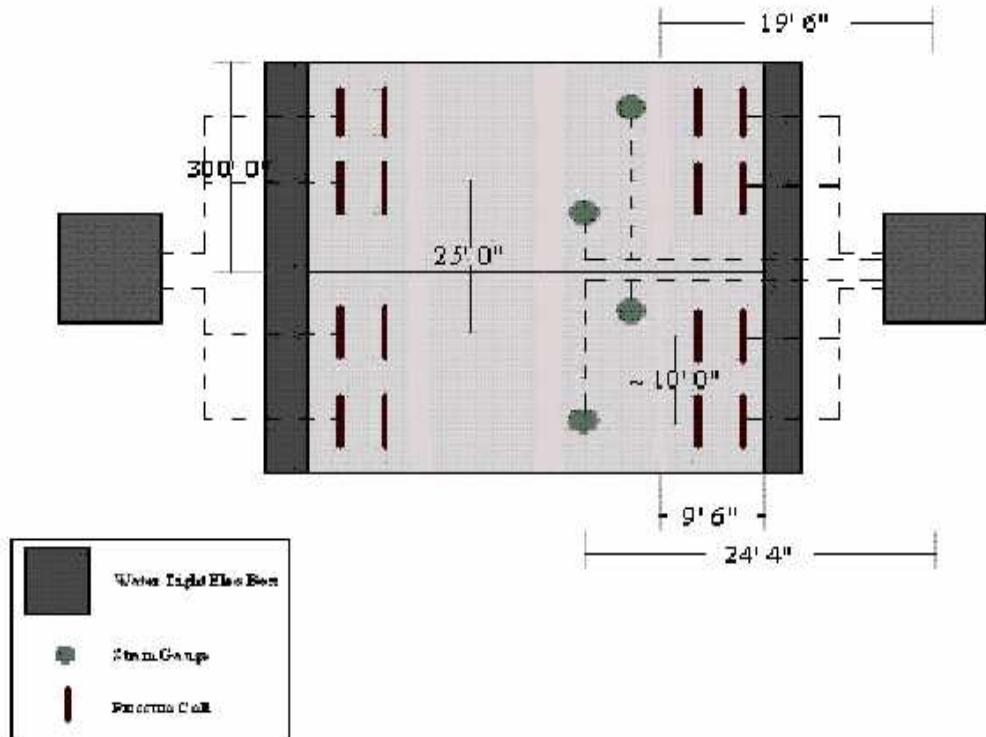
Proposed Positioning of Sensors (Details of two sections)
